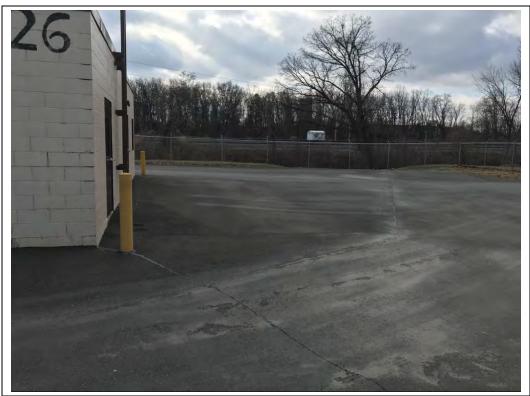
View from the eastern edge of MERECO property looking south. View shows a slight separation of a pavement joint filled with sealant/crack-filler
